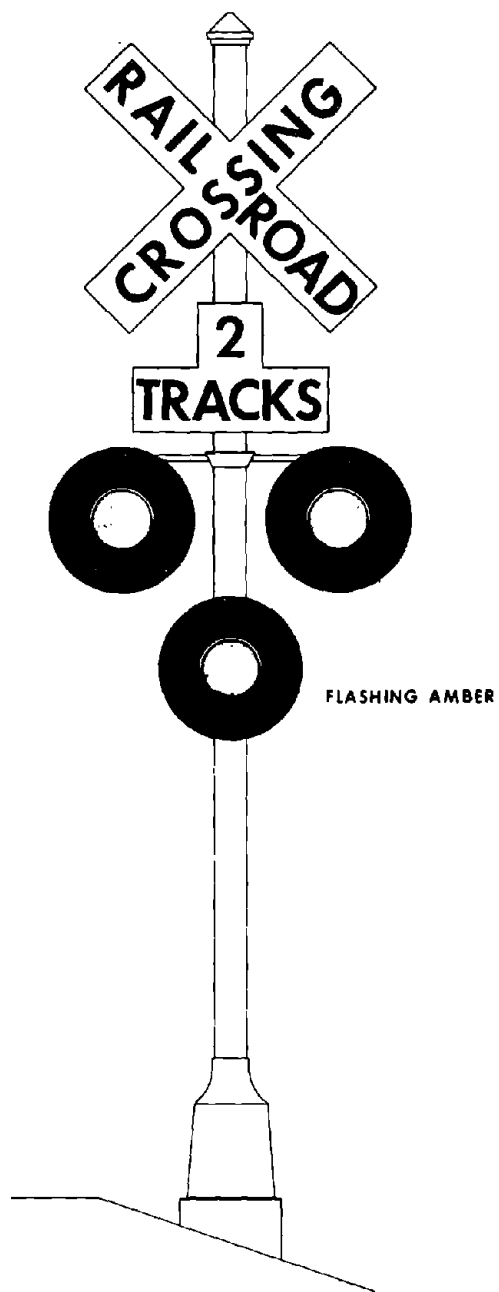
RAILROAD CROSSING TRAFFIC LIGHT
